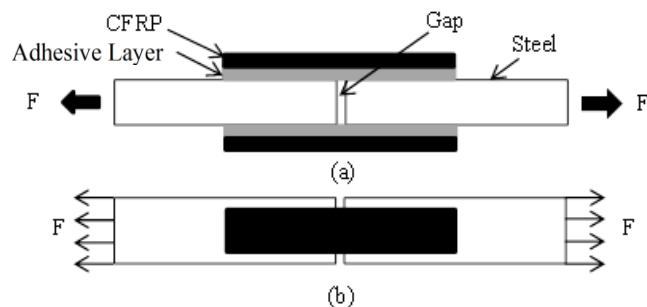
Double Strap Joint (a) Side view (b) Plan view [13]
